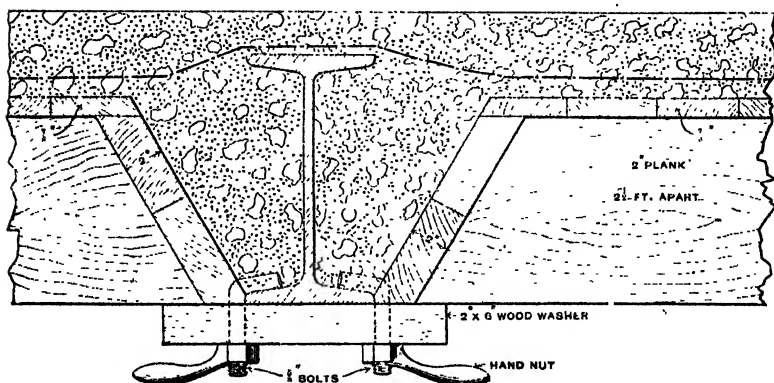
Form for Concrete Floor between Steel I-Beams. (See p. 616.)
